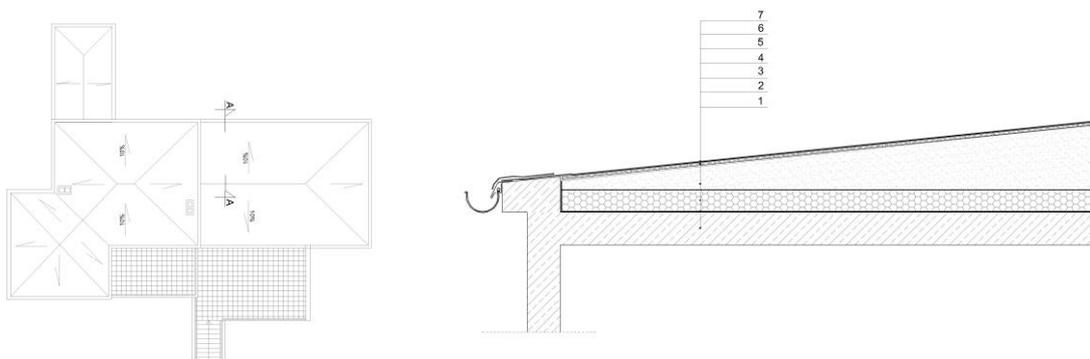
Single family house designed by Emil Lange, WuWA model Werkbund estate built in Wroclaw (former Breslau) in 1929. Flat roof plan and section of flat roof (renovation proposal): 1 – original roof construction 26 cm high, 2 – steam insulation, 3 – Styrodur thermal insulation 15 cm thick, 4 – insulation fibre, 5 – concrete decrease layer with light expanded clay aggregate , 6 – mortar bed, 7 - heat applied roofing felt (2 layers). Drawn by A.Tomaszewicz.
